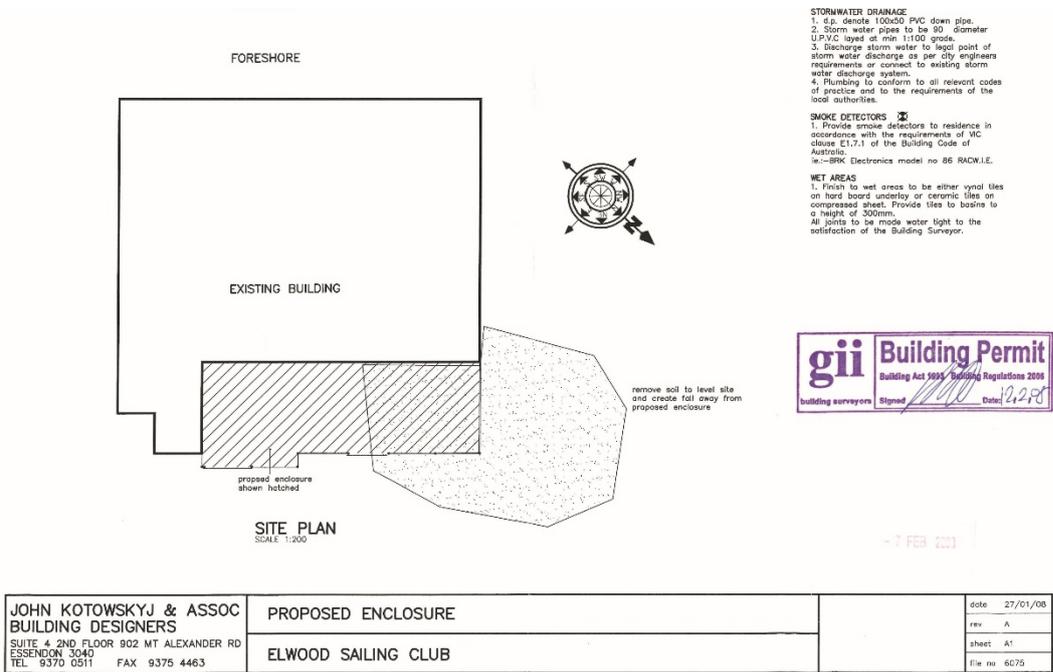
Site plan of the proposed enclosure, dated 2008 (Source: City of St Kilda)
